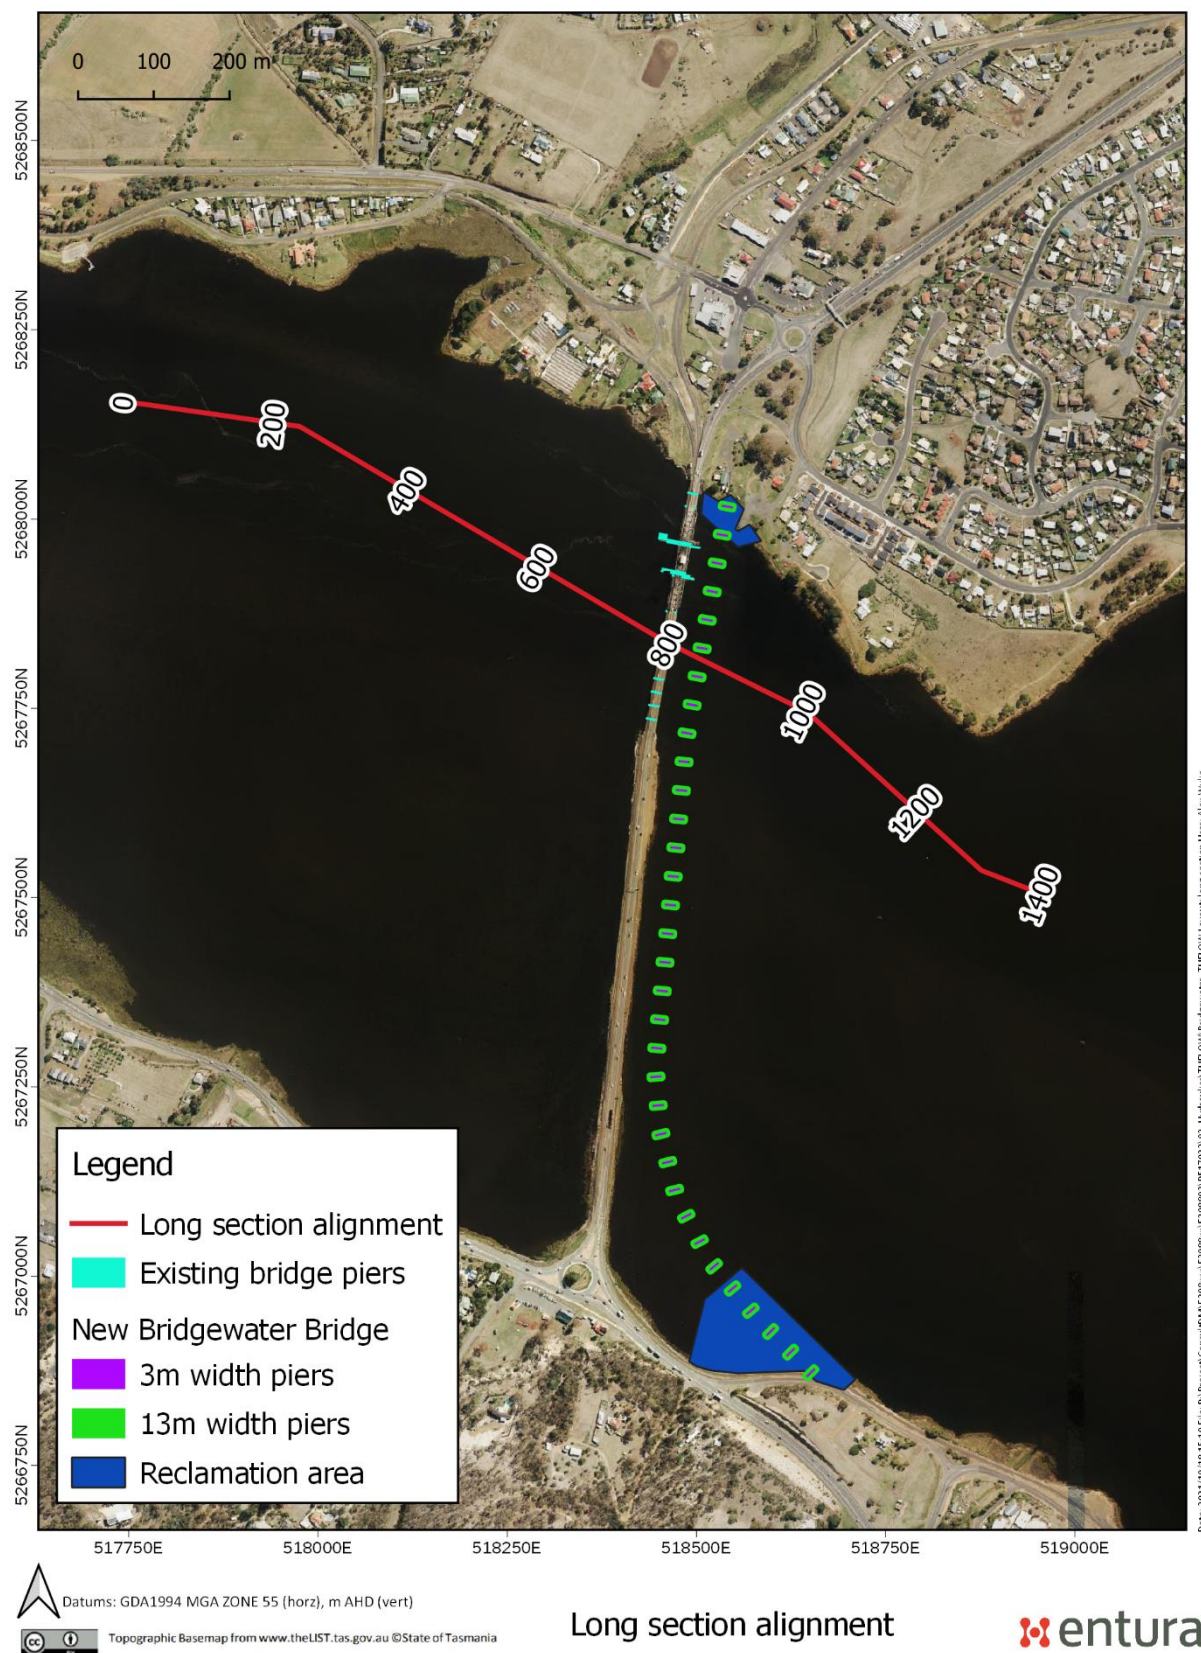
Existing and New Bridgewater Bridge with longitudinal section alignment
